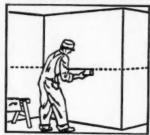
First remove all high spots on the walls and build up low spots with patching plaster. All corners must be straight and level and all walls thoroughly dry. Wire brush papered or painted surfaces before cementing the panels to walls. Find the lowest point in the floor, allow for the base, and measure up from this to the height of the panel. Establish a level line at that point around the room
